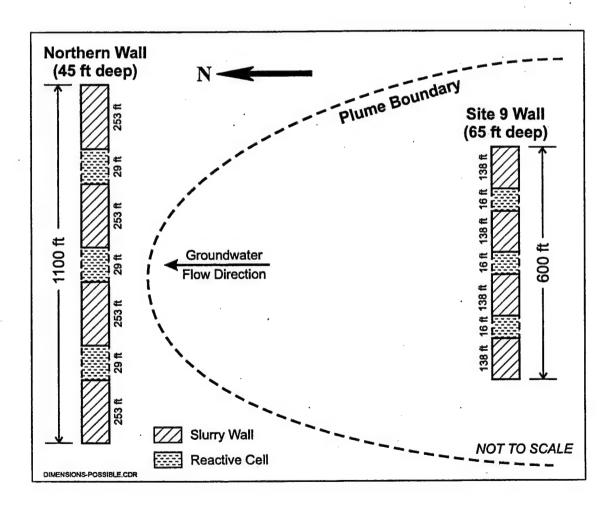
Configuration and Dimensions of Possible Full-Scale Barrier at Moffett Field
